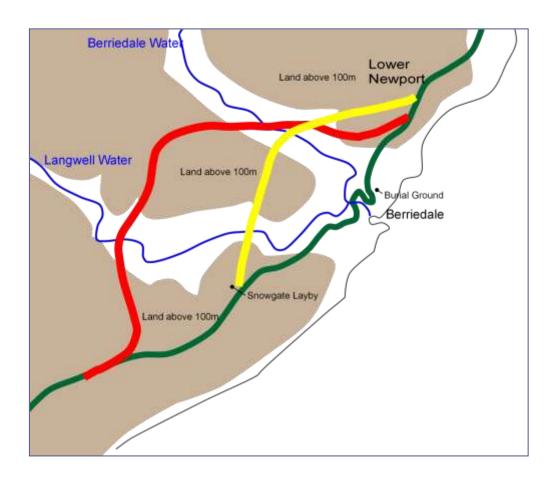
Plan showing corridors of High Level and Inland Viaducts (existing road shown green)
